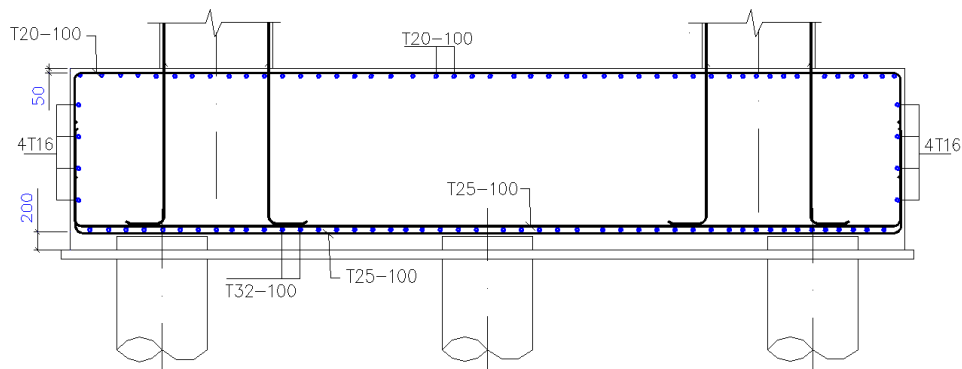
RC Bridge. Reinforcement details of the pile cap.
